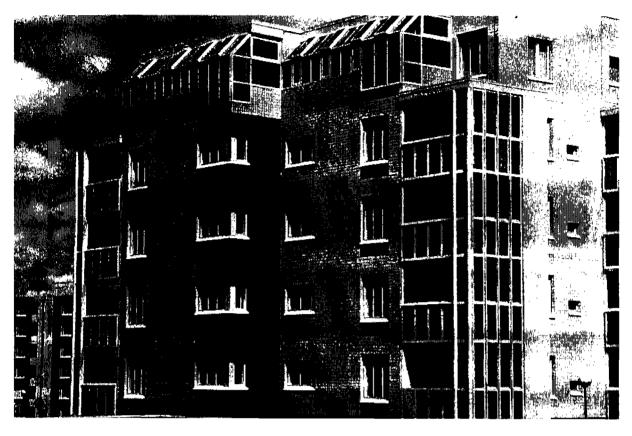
A block of flats with mechanical supply and exhaust ventilation unit in each flat and a wall exhaust solution. Outdoor air intakes and exhaust air openings are located in the same facade. Wall exhaust openings have longer shadows than outdoor air intakes.
